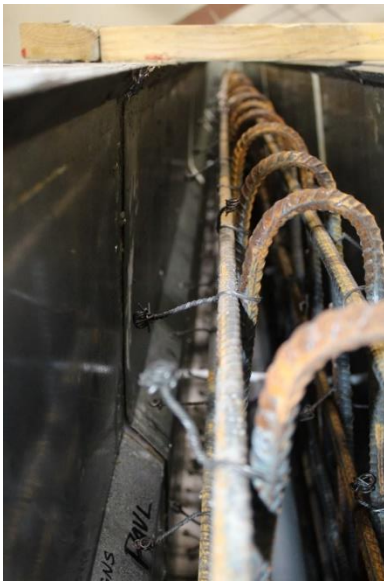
Deck-to-railing connection bars and end-support buttress reinforcement positioned inside deck formwork
